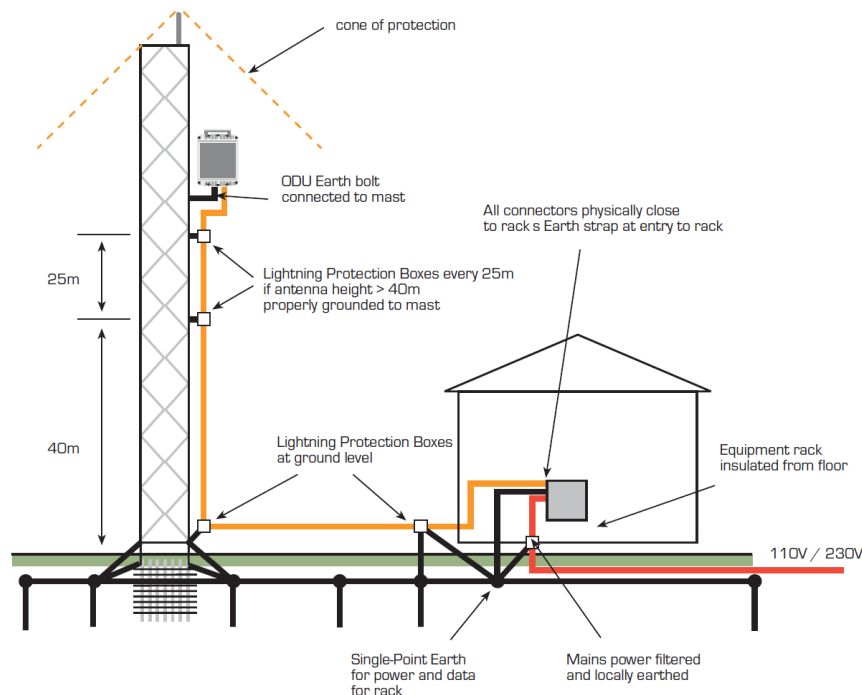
EXAMPLE OF TYPICAL LIGHTNING SURGE PROTECTION INSTALLATION
